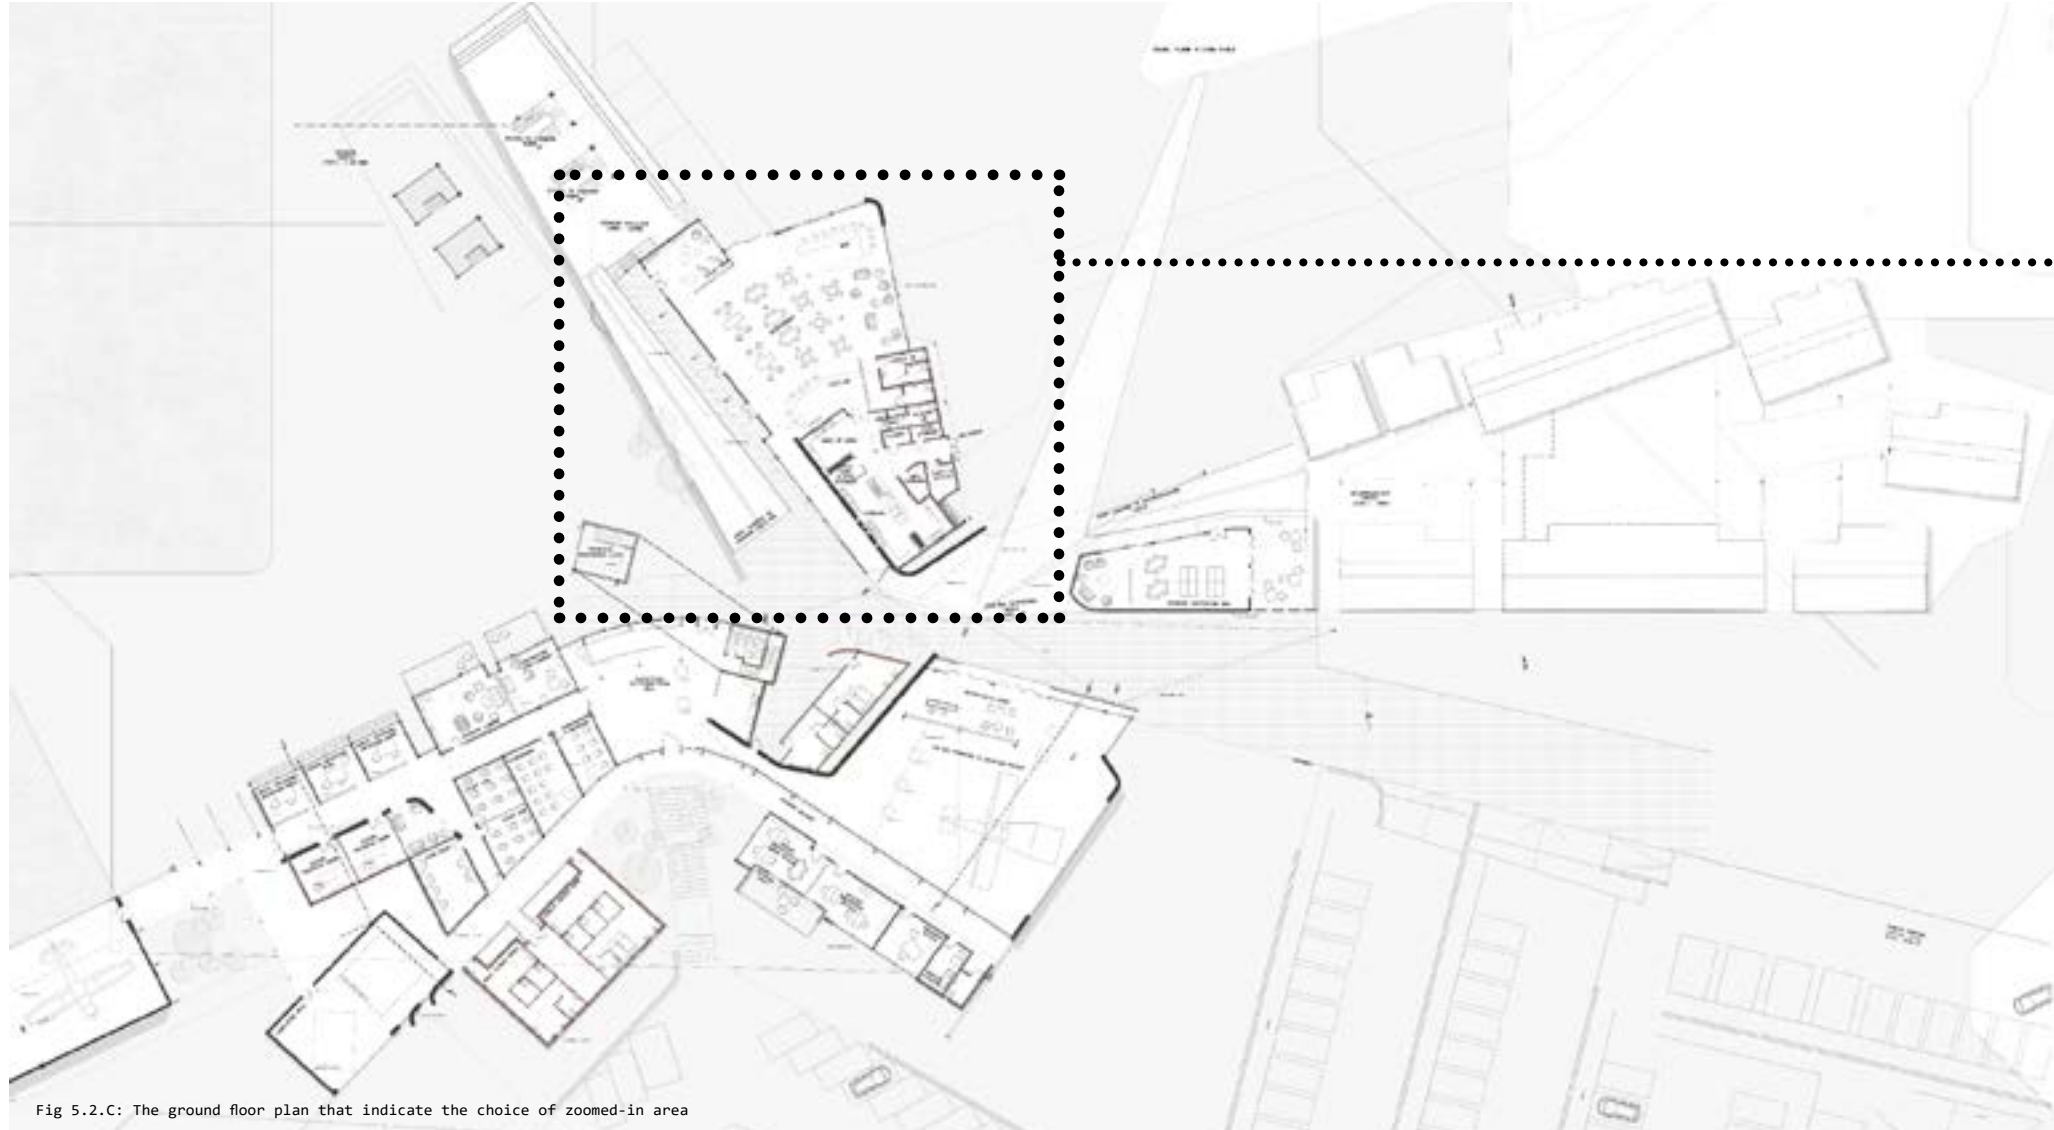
C: The ground floor plan that indicate the choice of zoomed-in area
